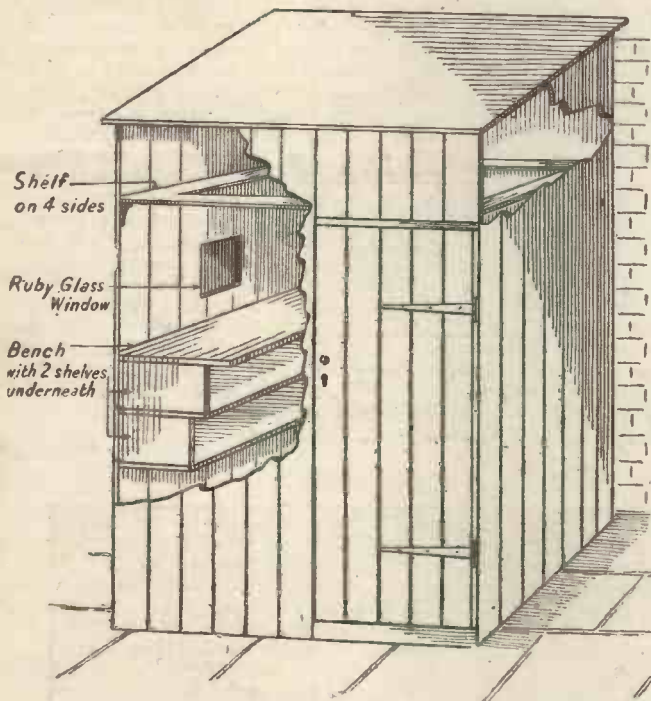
An outdoor darkroom, with part of front cut away to show shelving, etc.
